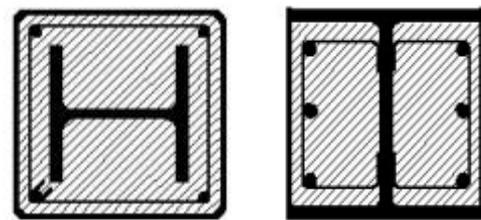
Fully concrete encased steel column Fig.2 Partially concrete encased steel (CES) column
